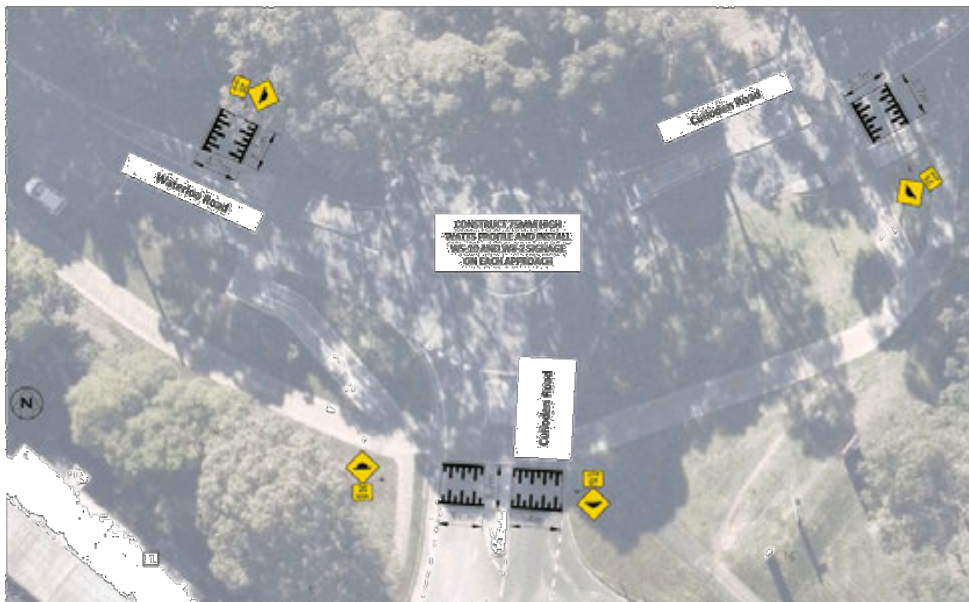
Location of proposed speed humps at the intersection of Culloden Road and Waterloo Road
